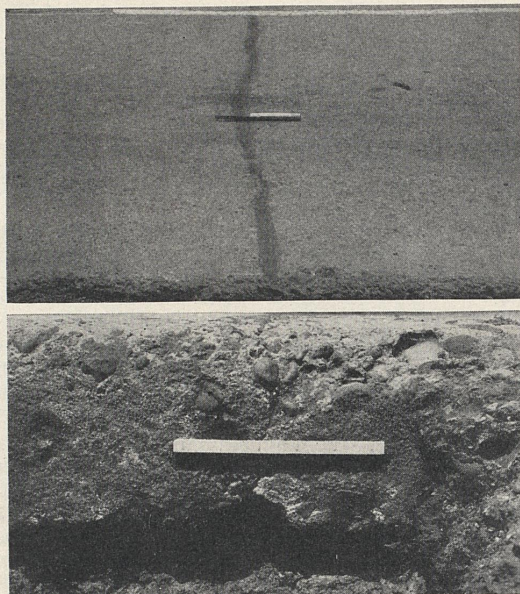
TYPICAL CRACK IN A HEAVILY REINFORCED SECTION OF THE COLUMBIA PIKE EXPERIMENTAL PAVEMENT AFTER 18 YEARS OF SERVICE. UPPER, SURFACE OF PAVEMENT; LOWER, EDGE OF SLAB.
